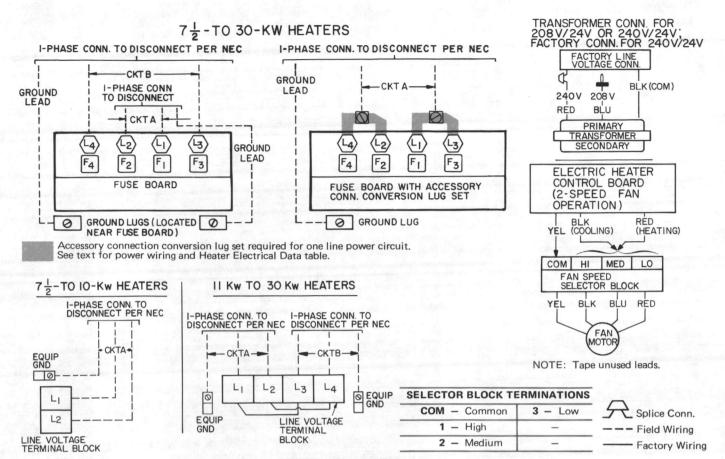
40QB Heating and Cooling Unit Line Power Connections
